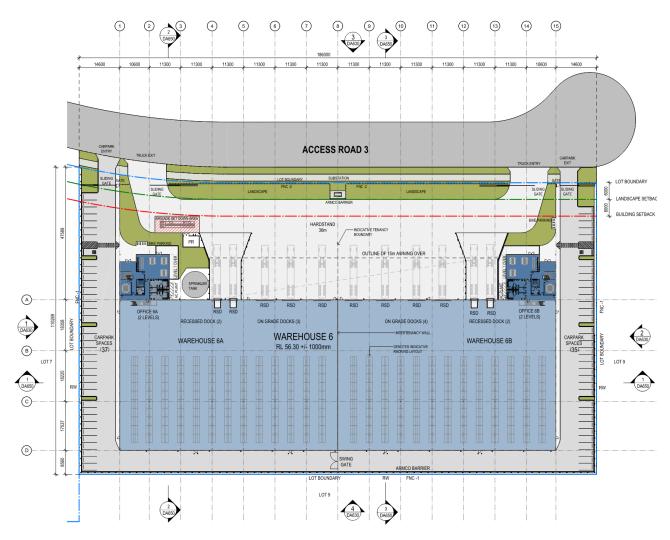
Lot 6 Site and Warehouse Floor Plan (SBA Architects, dated 19/02/2024)
